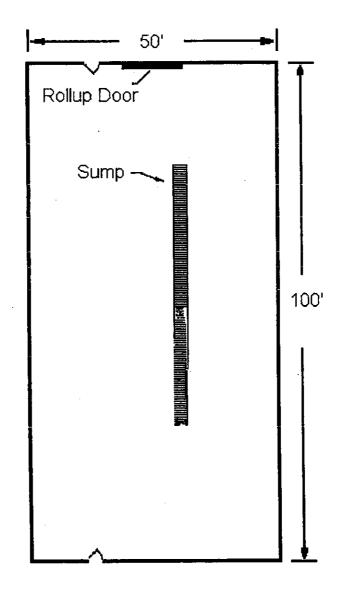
(Proposed) Bulk Contaminated Soil Storage Facility, Building 7576.
